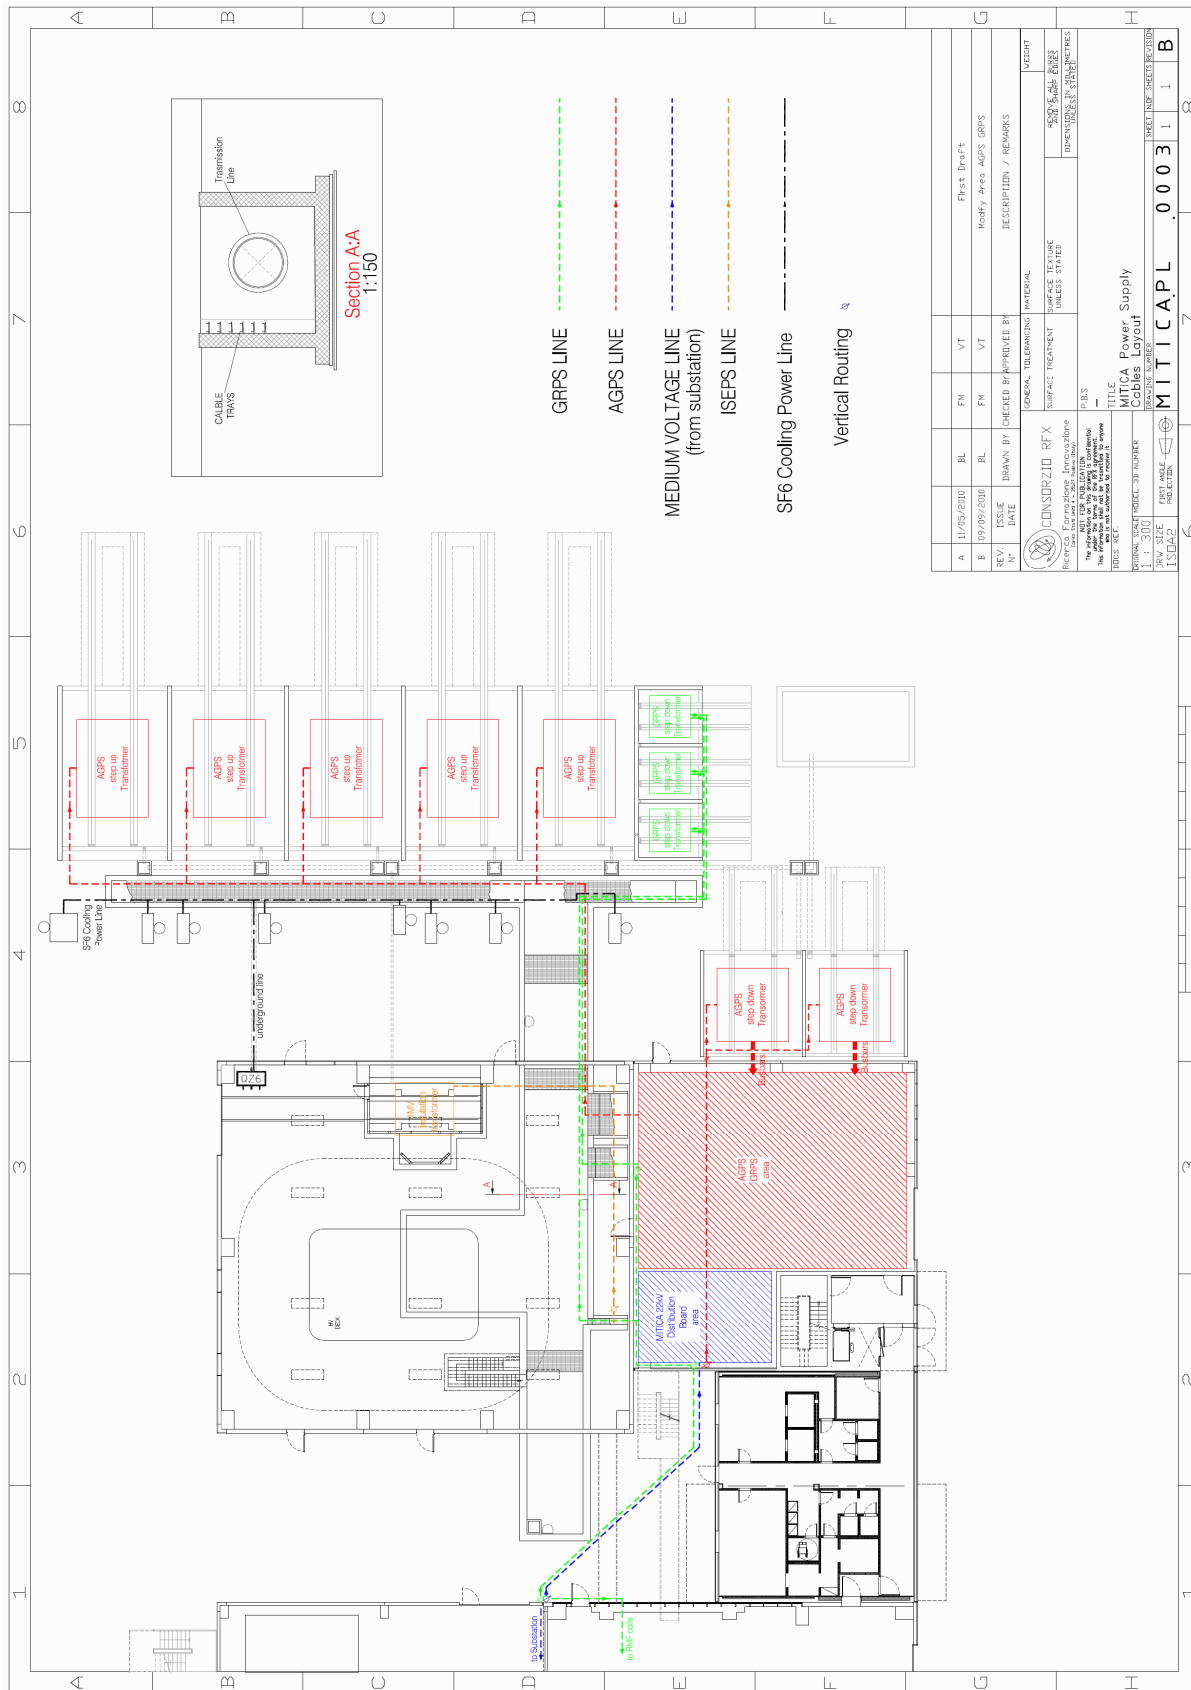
Layout of the PS buildings and facilities of all the neutral beam injectors in ITER
